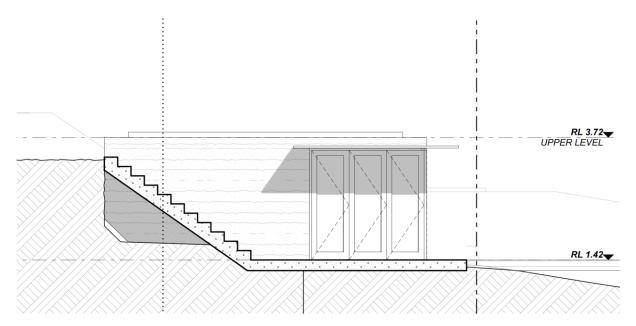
East Elevation of Proposed Development (extract from drawings by Gartner Trovato Architects (2022, provided in Appendix B))
